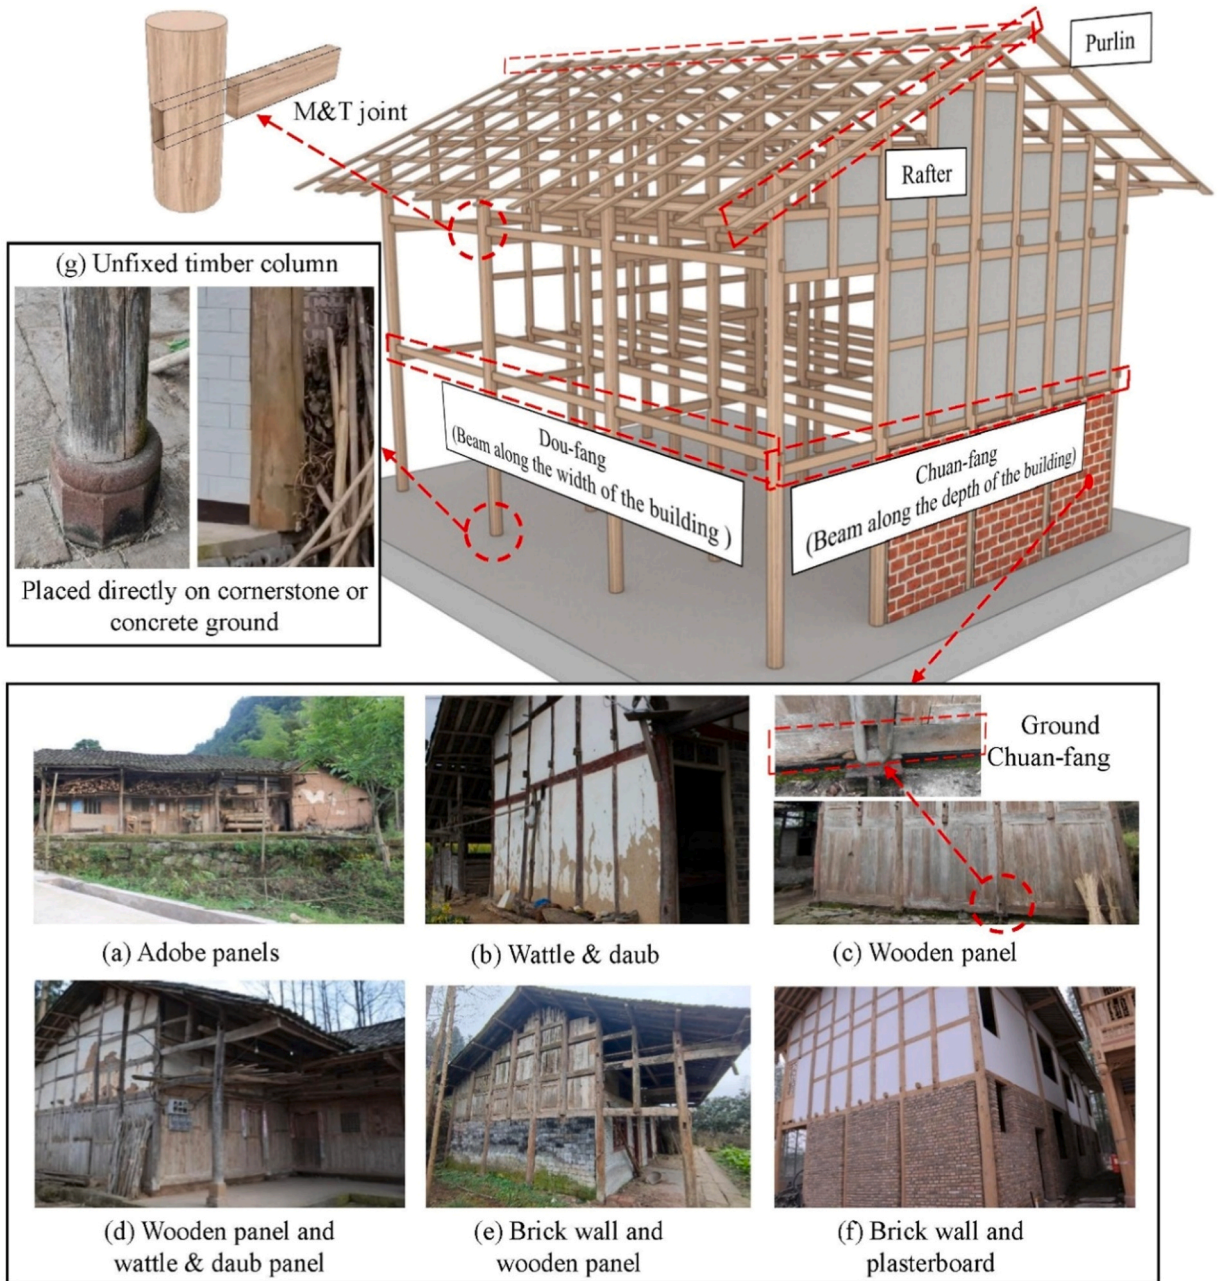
The construction form and common wall types of Chuan-dou timber structures [36].
